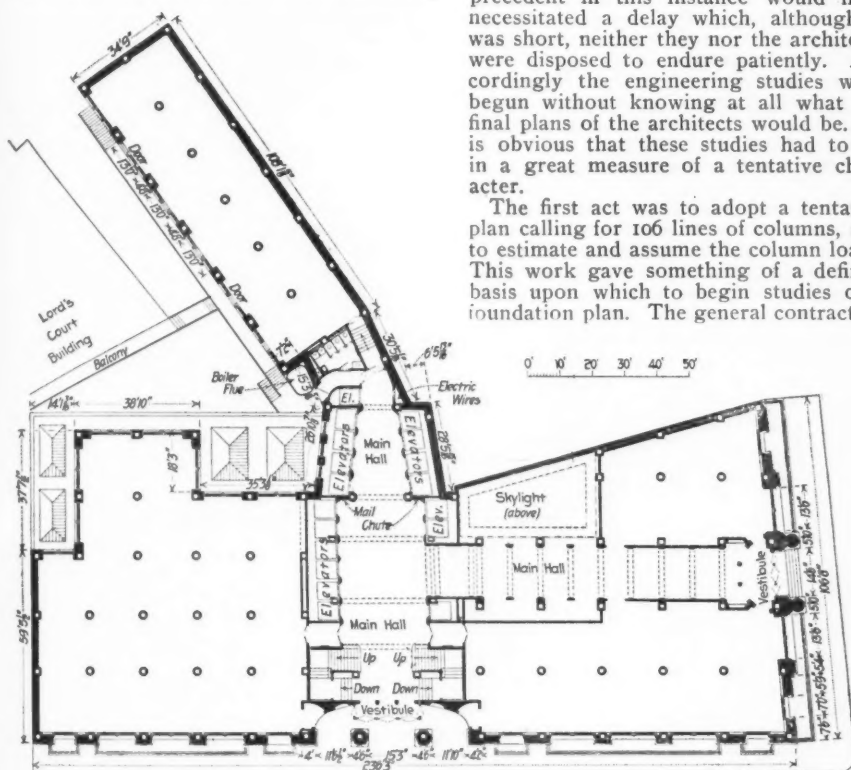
FIRST FLOOR PLAN OF BROAD EXCHANGE BUILDING, NEW YORK CITY.
